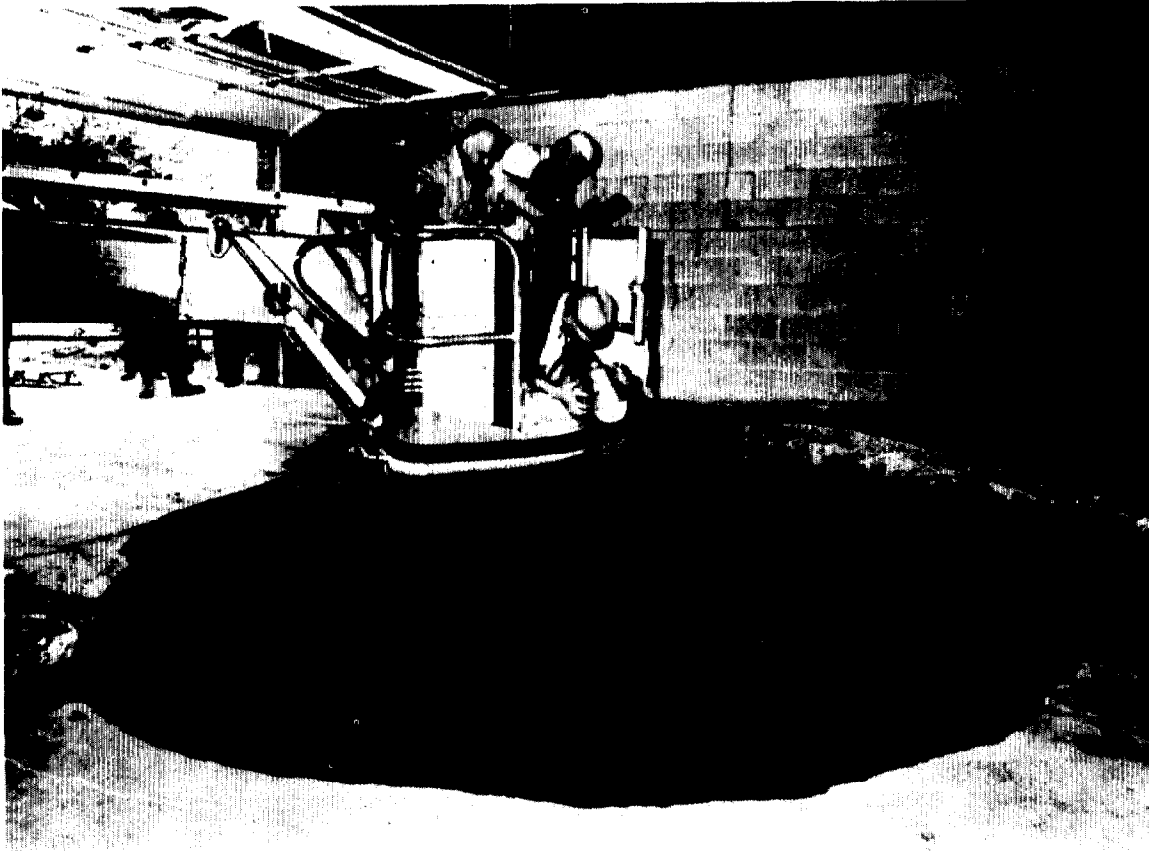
CONCRETE GARAGE FLOOR DESTROYED
